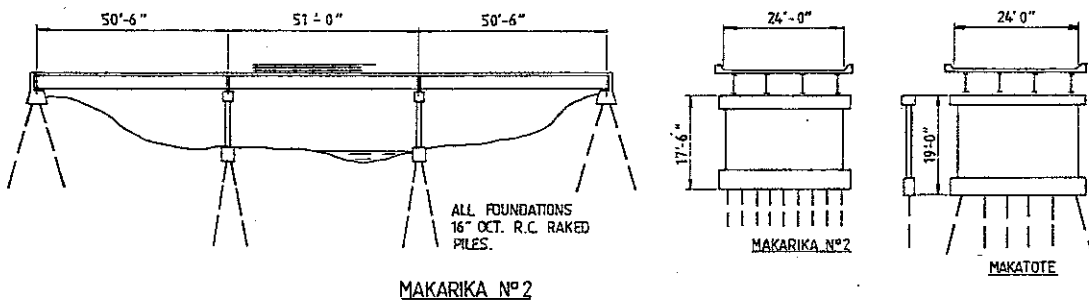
GENERAL ARRANGEMENT TYPICAL OF SLAB PIER BRIDGES
